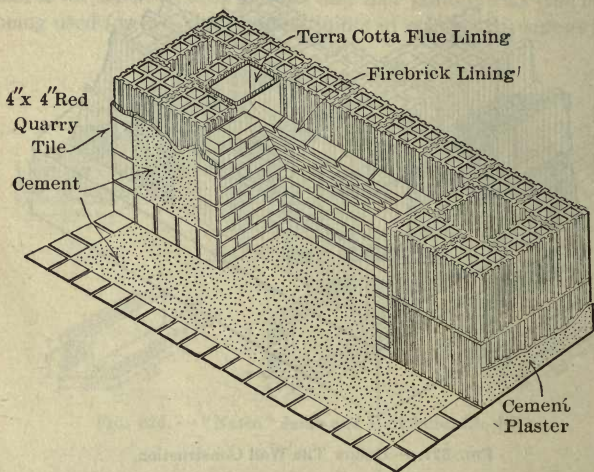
Hollow Tile Fireplace and Flue Construction.
